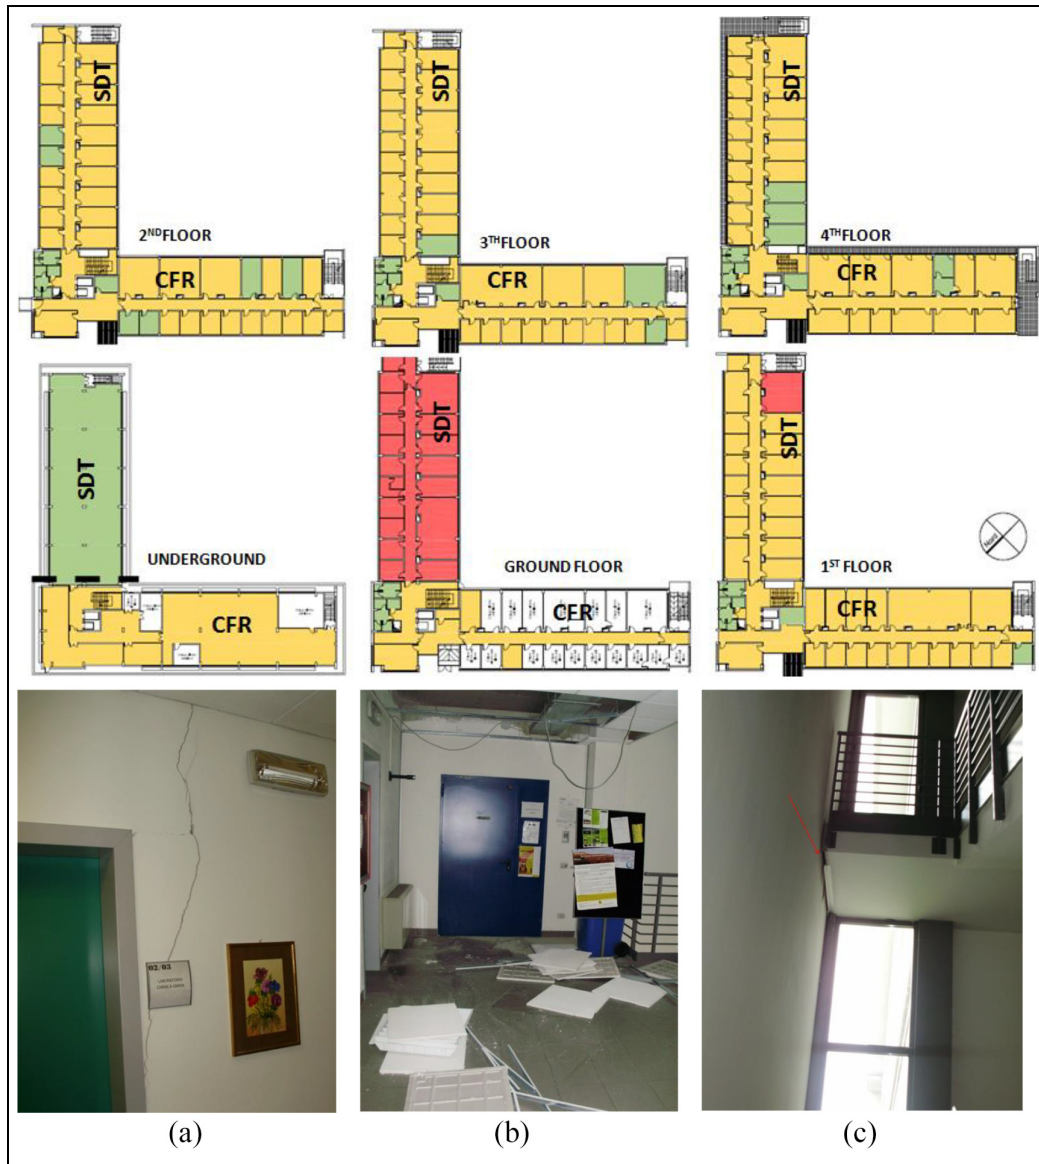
Damage assessment performed at the SDT and CFR blocks of the University of Ferrara (slight damage, in yellow, and medium-severe damage to the infill walls in red): details of the damage (a, c) at the SDT ground floor and (b) at the third floor. The red arrow highlights a gap formed during the earthquake (~ 3 cm) between the SDT building and the stair body.
